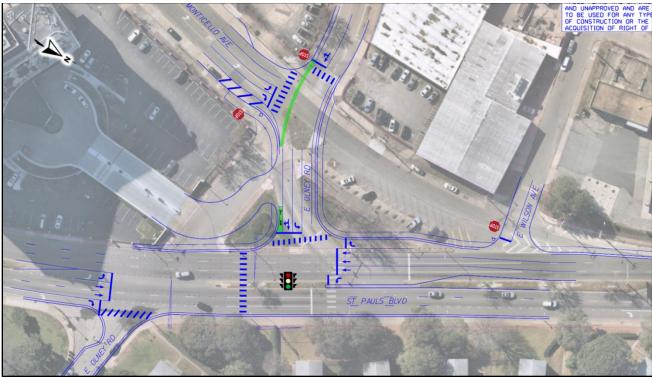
Phase 2 Concept – St. Paul's Boulevard & Monticello Avenue at Olney Road Reconfiguration – Existing Olney Alignment
